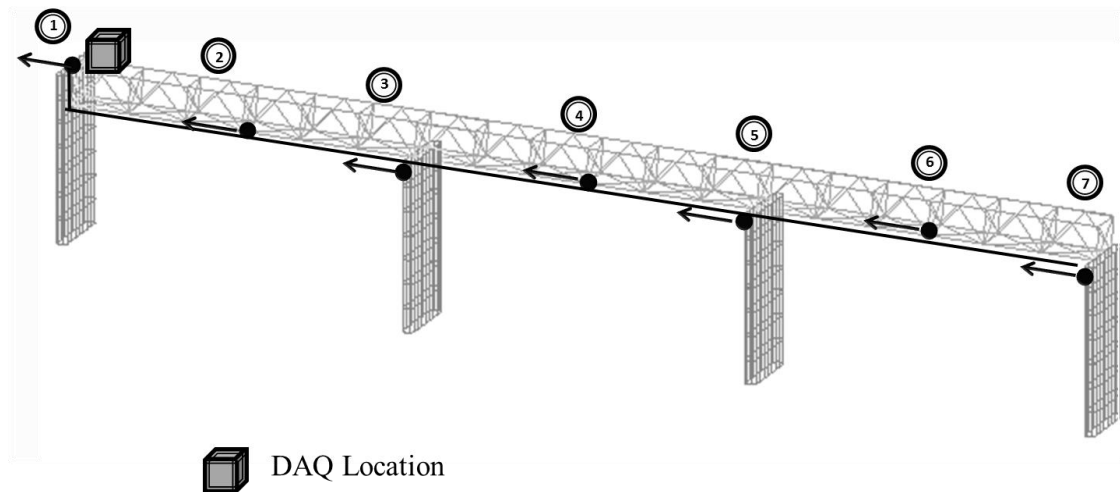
PA Truss Longitudinal Instrumentation Plan
